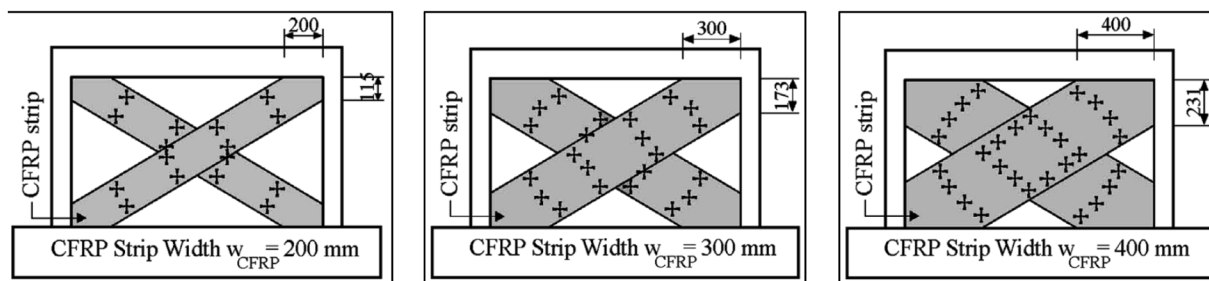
CFRP strip configuration used in specimens (Altin et al., 2008)
